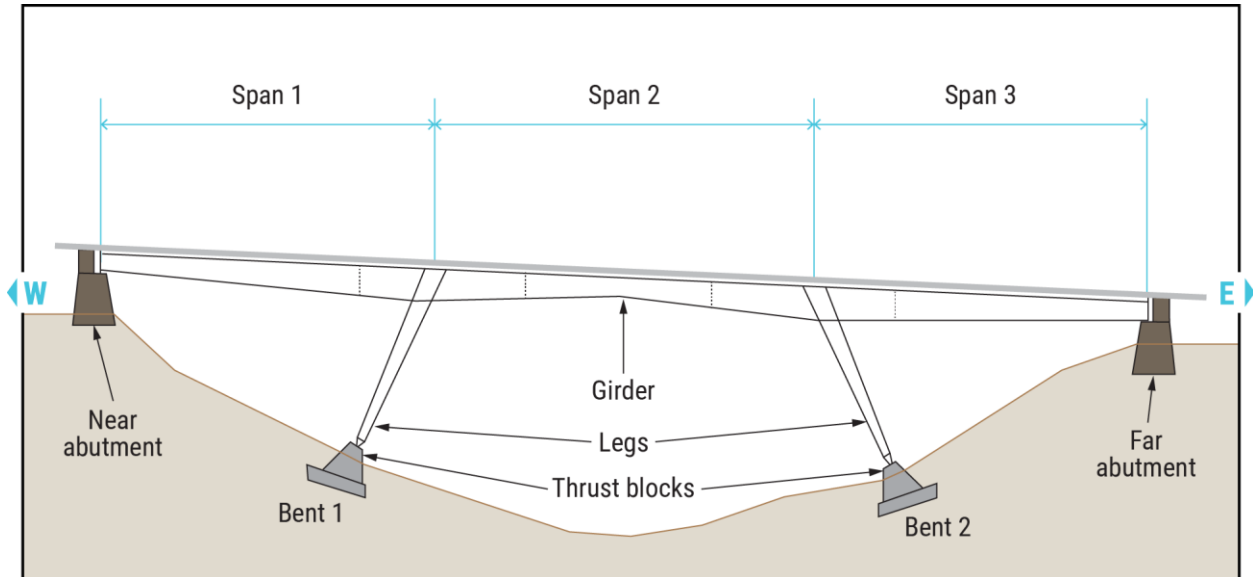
Simplified side (elevation) view of K-frame structure of Fern Hollow Bridge (looking north). Bents 1 and 2 were composed of two legs each; only the southwest and southeast legs are visible in this diagram.
